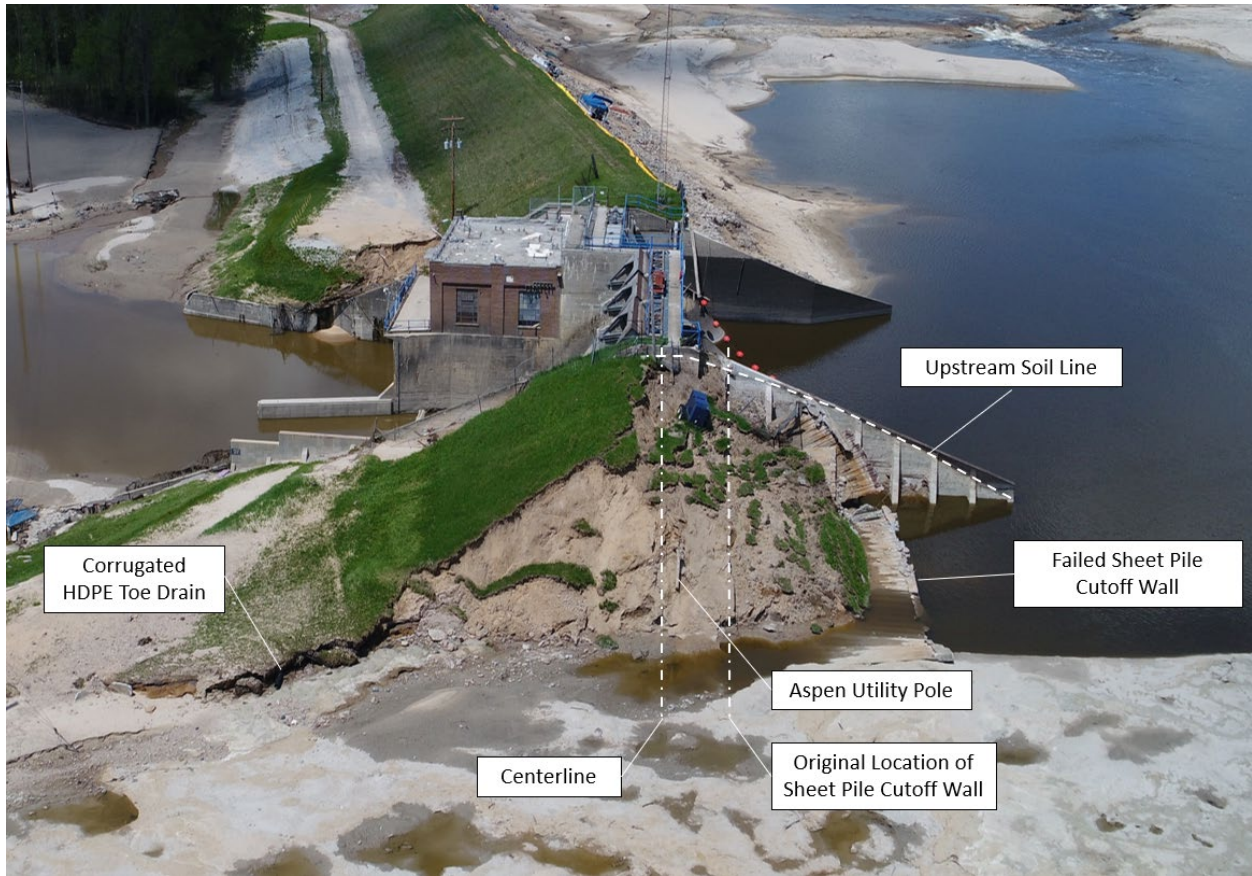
Aerial View of Right Breach Remnant (photo courtesy of EGLE)
